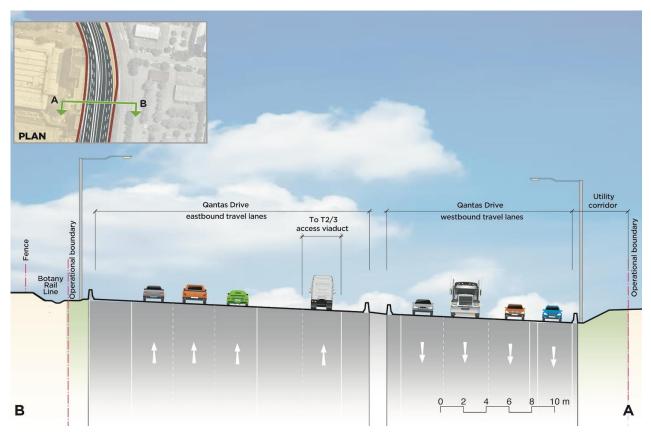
Qantas Drive upgrade and extension between King Street and Ewan Street – typical cross- section (looking south)
